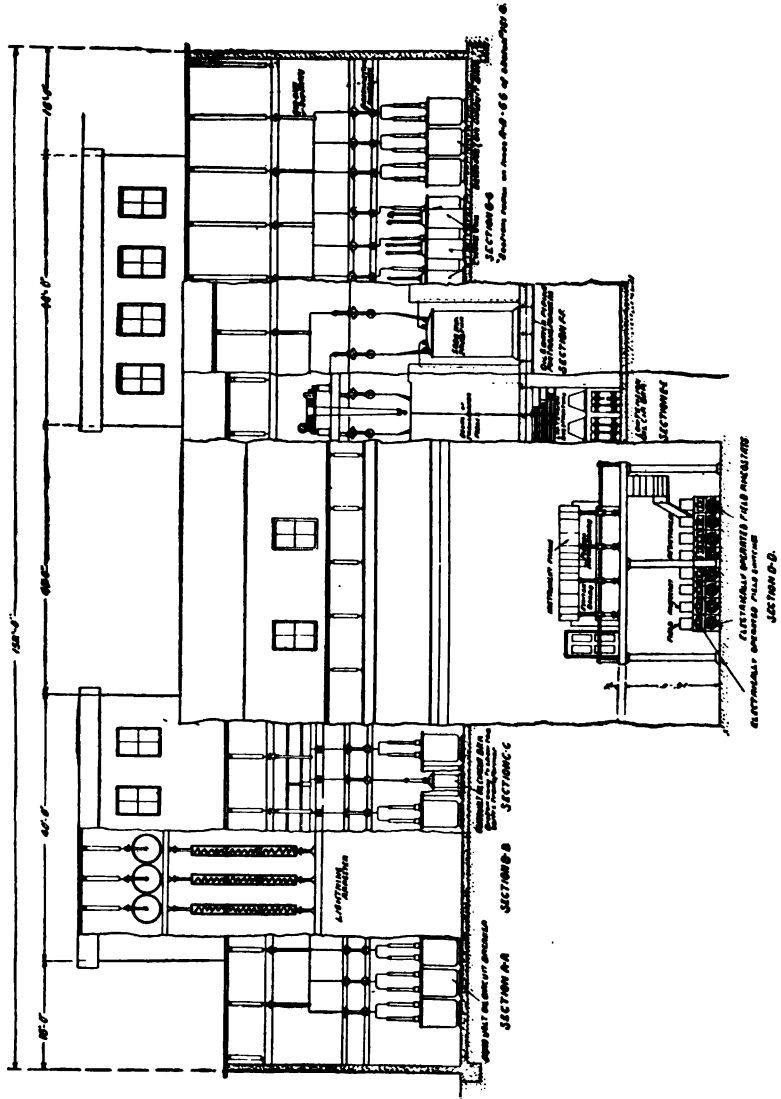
Elevation of transformer and switching house, 60,000-volt plant
